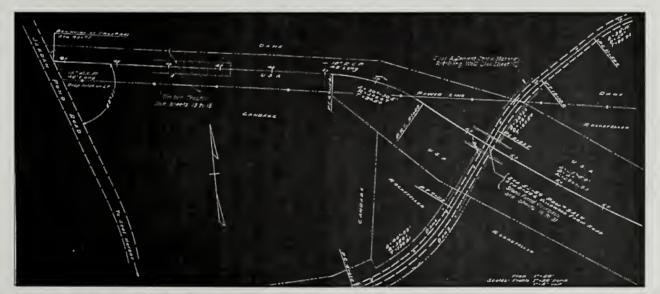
Plan showing the temporary alignment at the west end of Day Mountain Road, 1939. (U.S. Department of Agriculture, Bureau of Public Roads, Project 9A1, Sheet 3 of x, June 1939)
